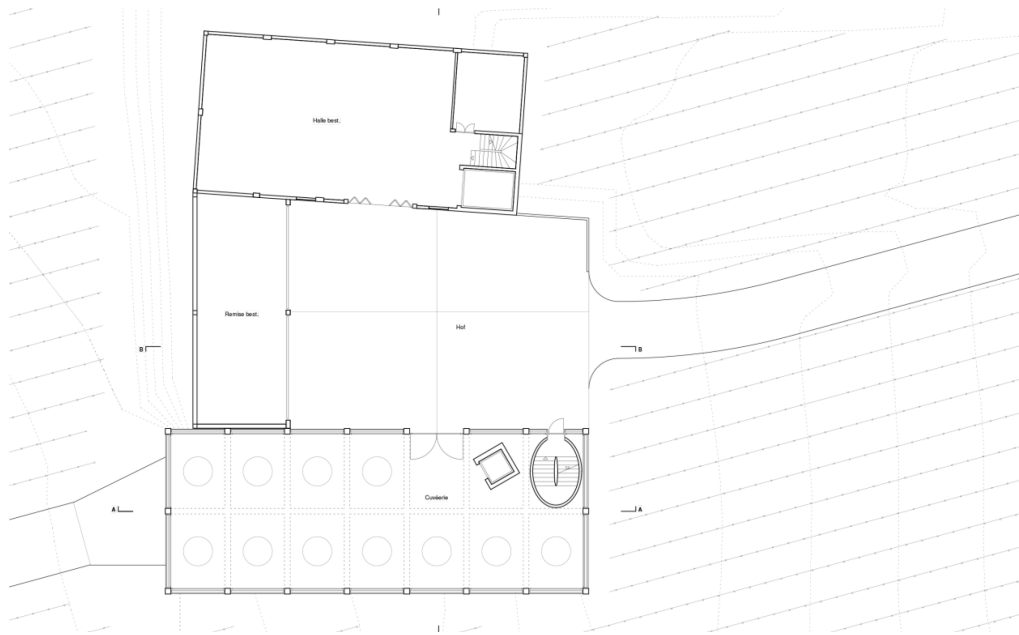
Ground floor plan of the winery complex with the new extension building at the bottom.
